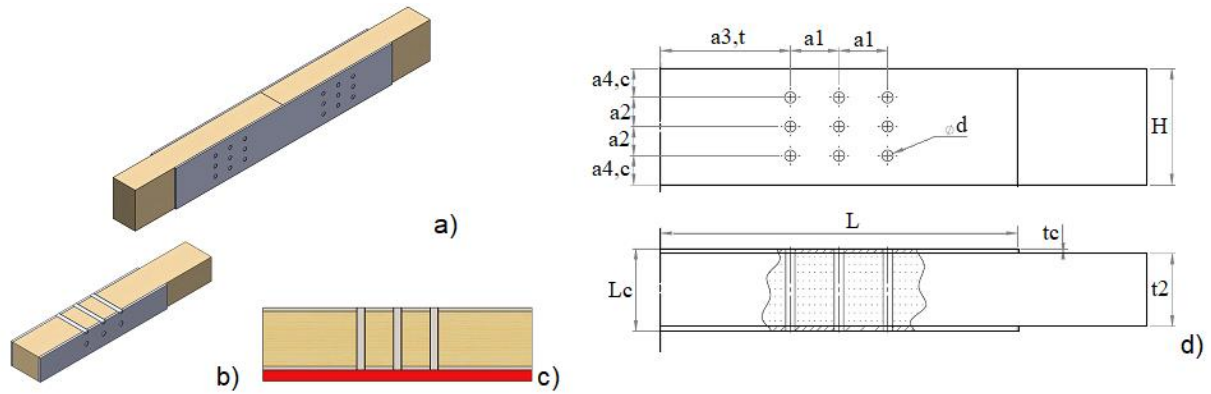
S-W-S connections: a) 3D view, b) unprotected plane, c) protected plane, d) dimensions.
